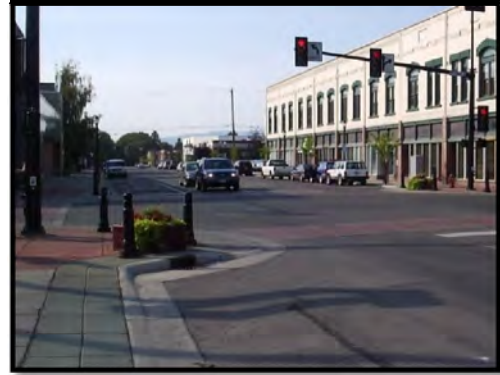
Curb extensions installed in downtown Kalispell create shorter pedestrian crossing distances.
